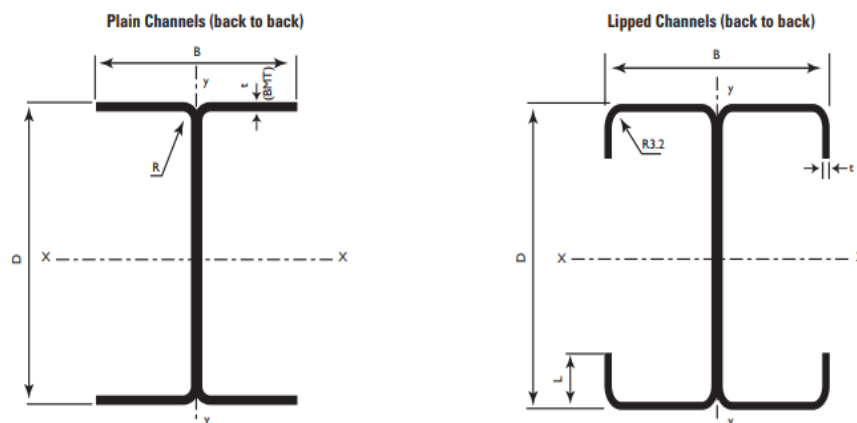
Dimension of the built-up C-section plain and lipped angles
